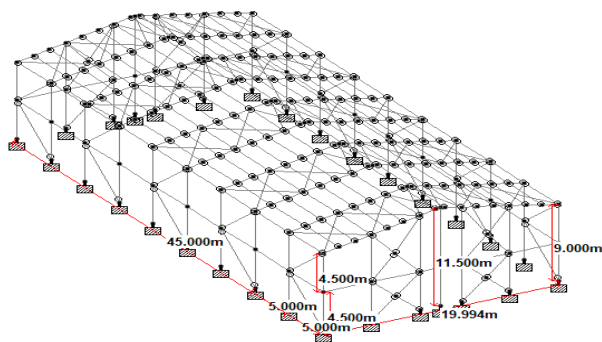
Pre-Engineered Building Structure (Diagonal bracing)
